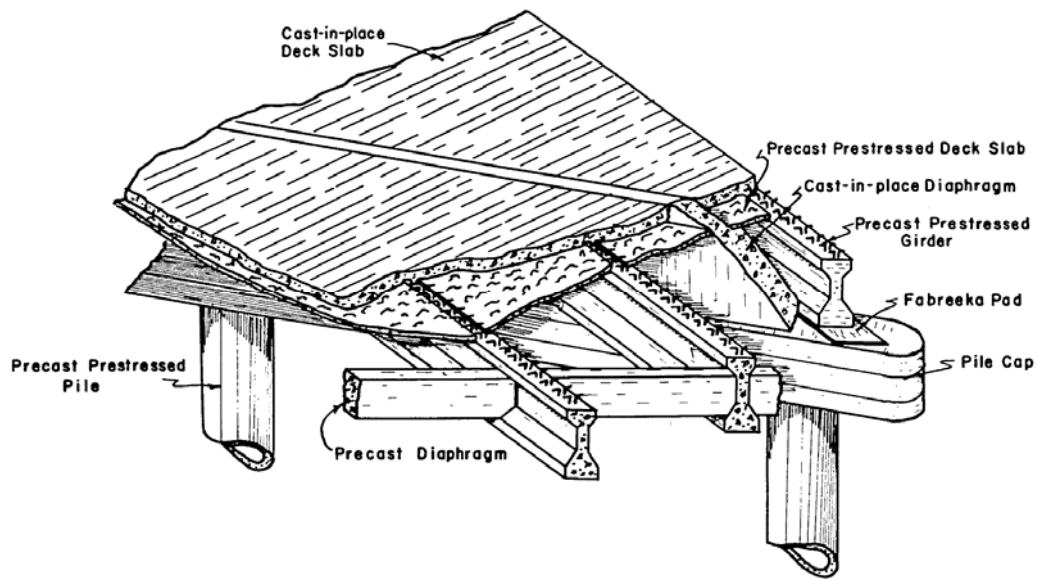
Cutaway of Beverly Road Test Bridge (Janney & Eney, 1957)
